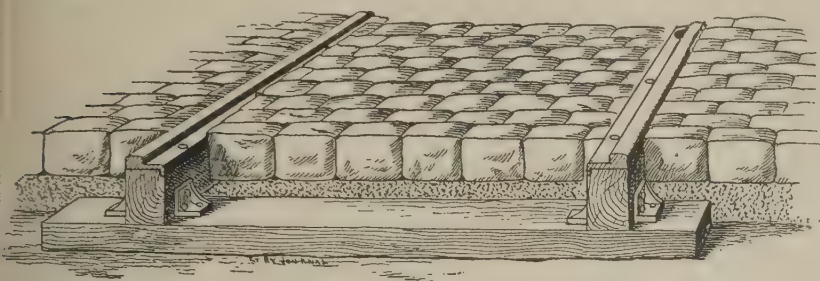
STRINGER CONSTRUCTION WITH SIDE BEARING TRAM RAIL.
